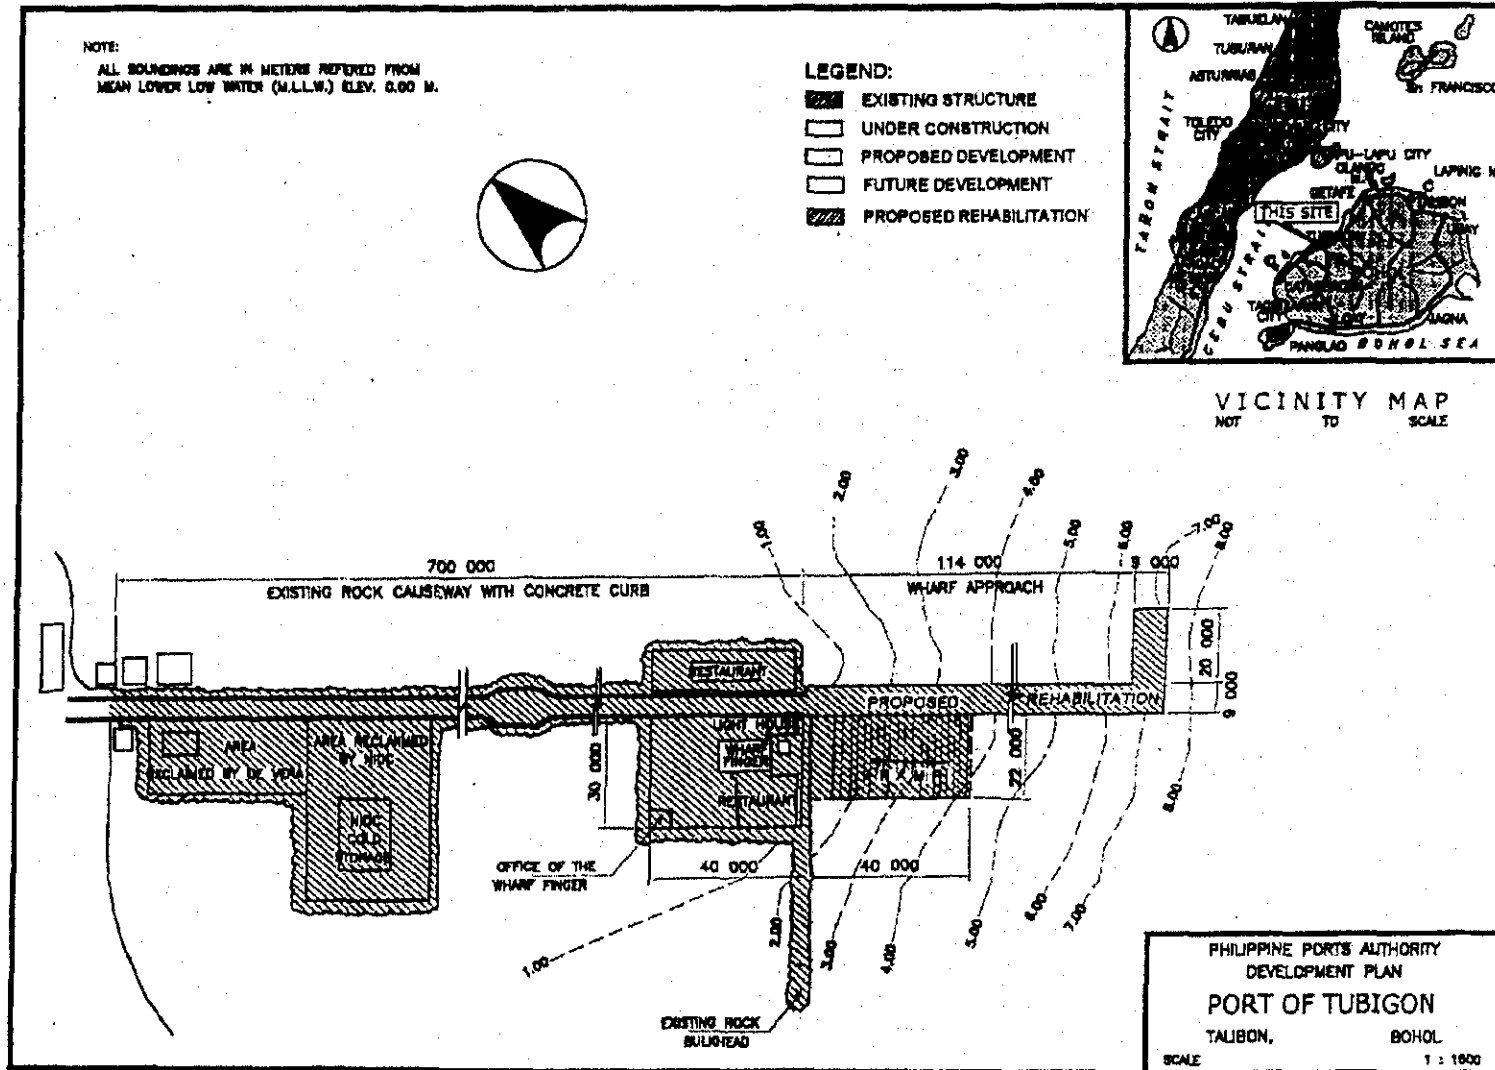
Development Plan - Port of Tubigon
